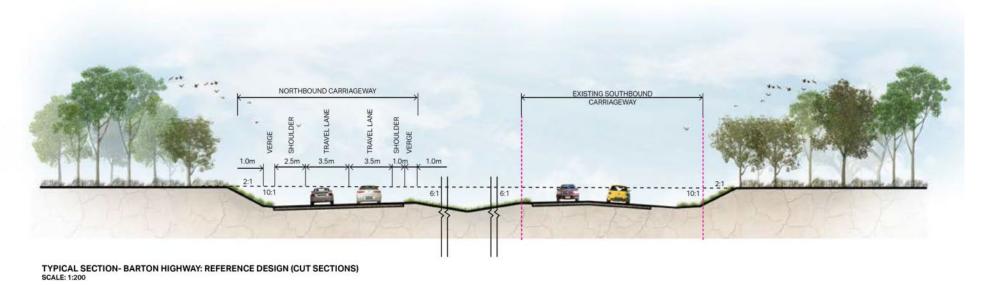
Typical cross section of Barton Highway for fill and cut sections
